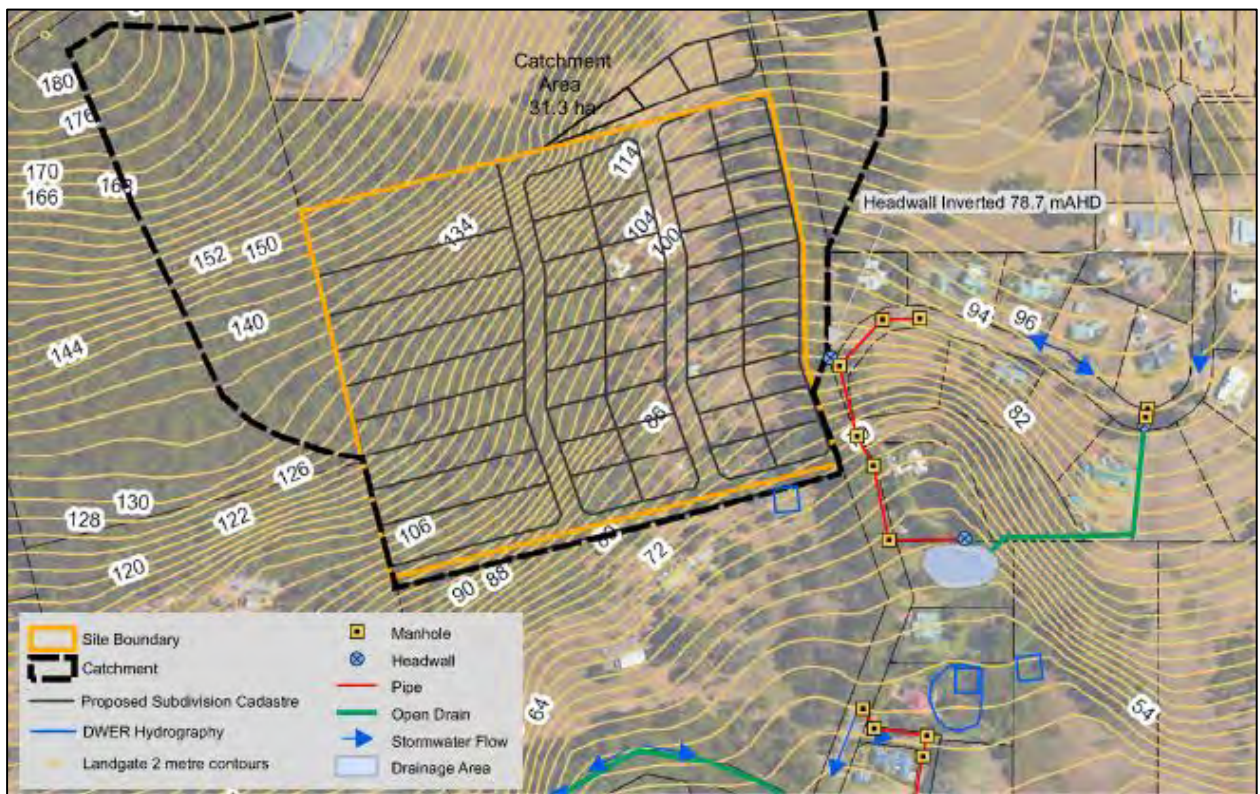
Stormwater Drainage Catchment Plan (Hyd2o)
